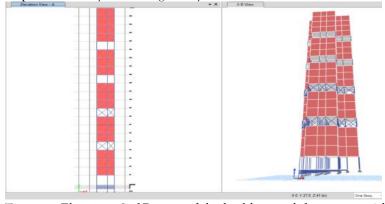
Elevation & 3D view of the building with bracings at 4th+8th floors on 5° sloping ground
